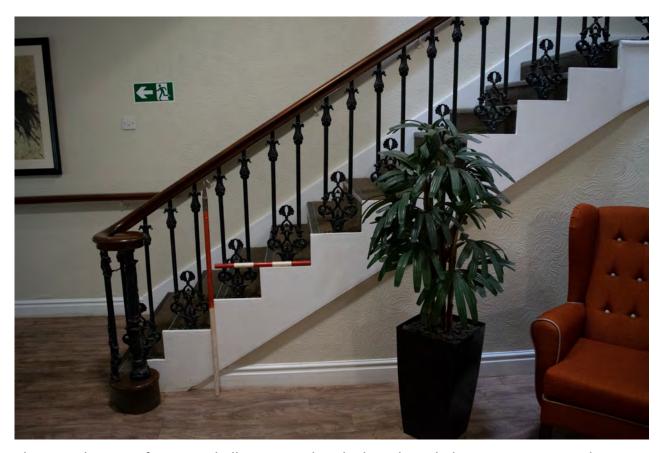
Close up of entrance hall's staircase handrails and iron balusters. 1mx0.5m scale.
